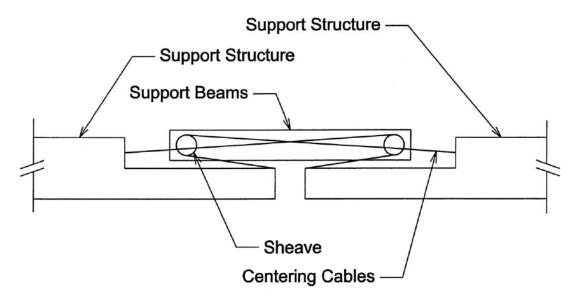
Cable System for Centering the Track Bridge (from [1])
